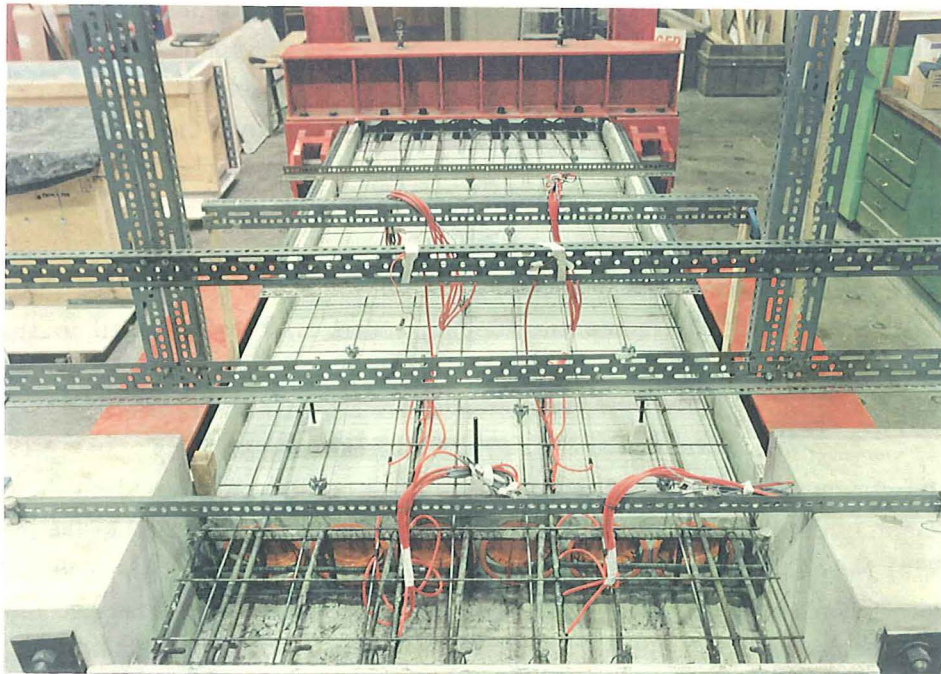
Typical LOS test set-up before the addition of topping concrete
